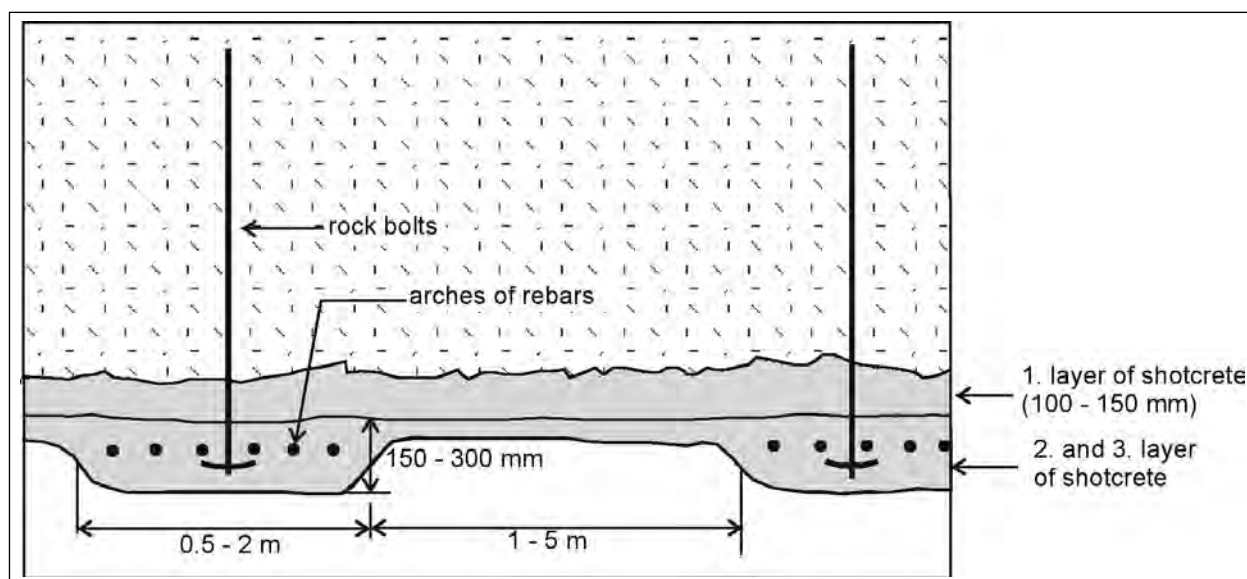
Typical design of shotcrete ribs used at Frøya and other Norwegian sub sea tunnels.
